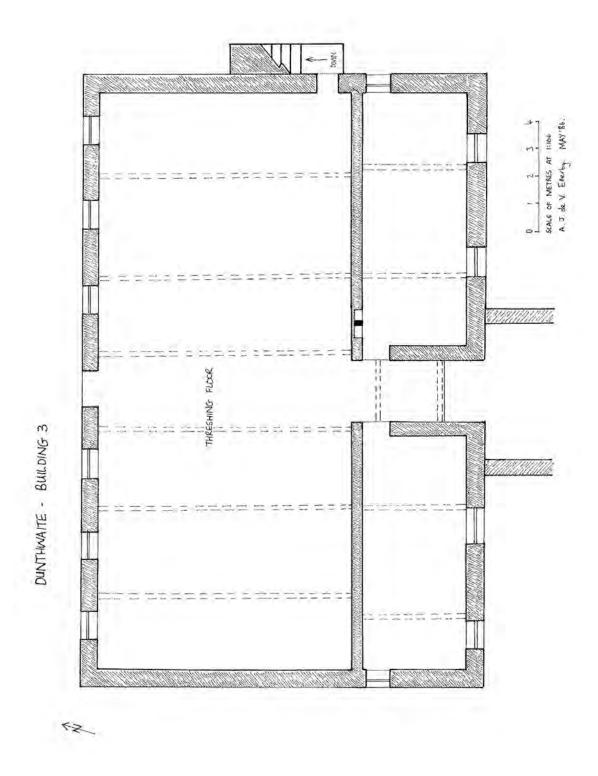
1986 survey, Building 3 upper floor plan (Higgins 1986).
